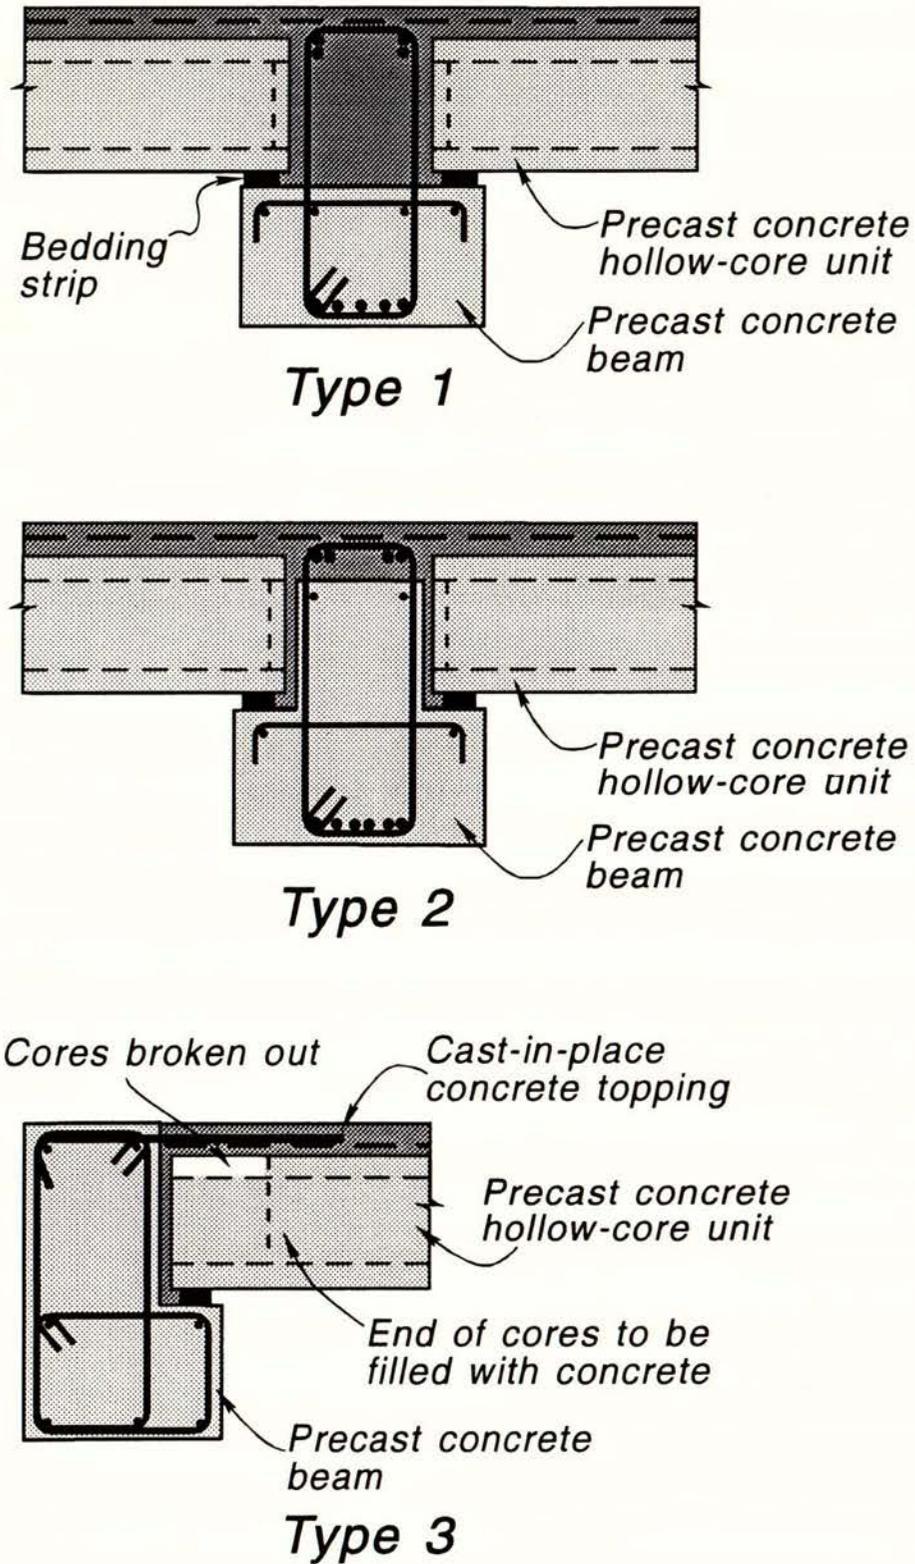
Types of Support of Precast Concrete Hollow-Core Floor Units by Precast Concrete Beams According to the New Zealand Guidelines [1]
